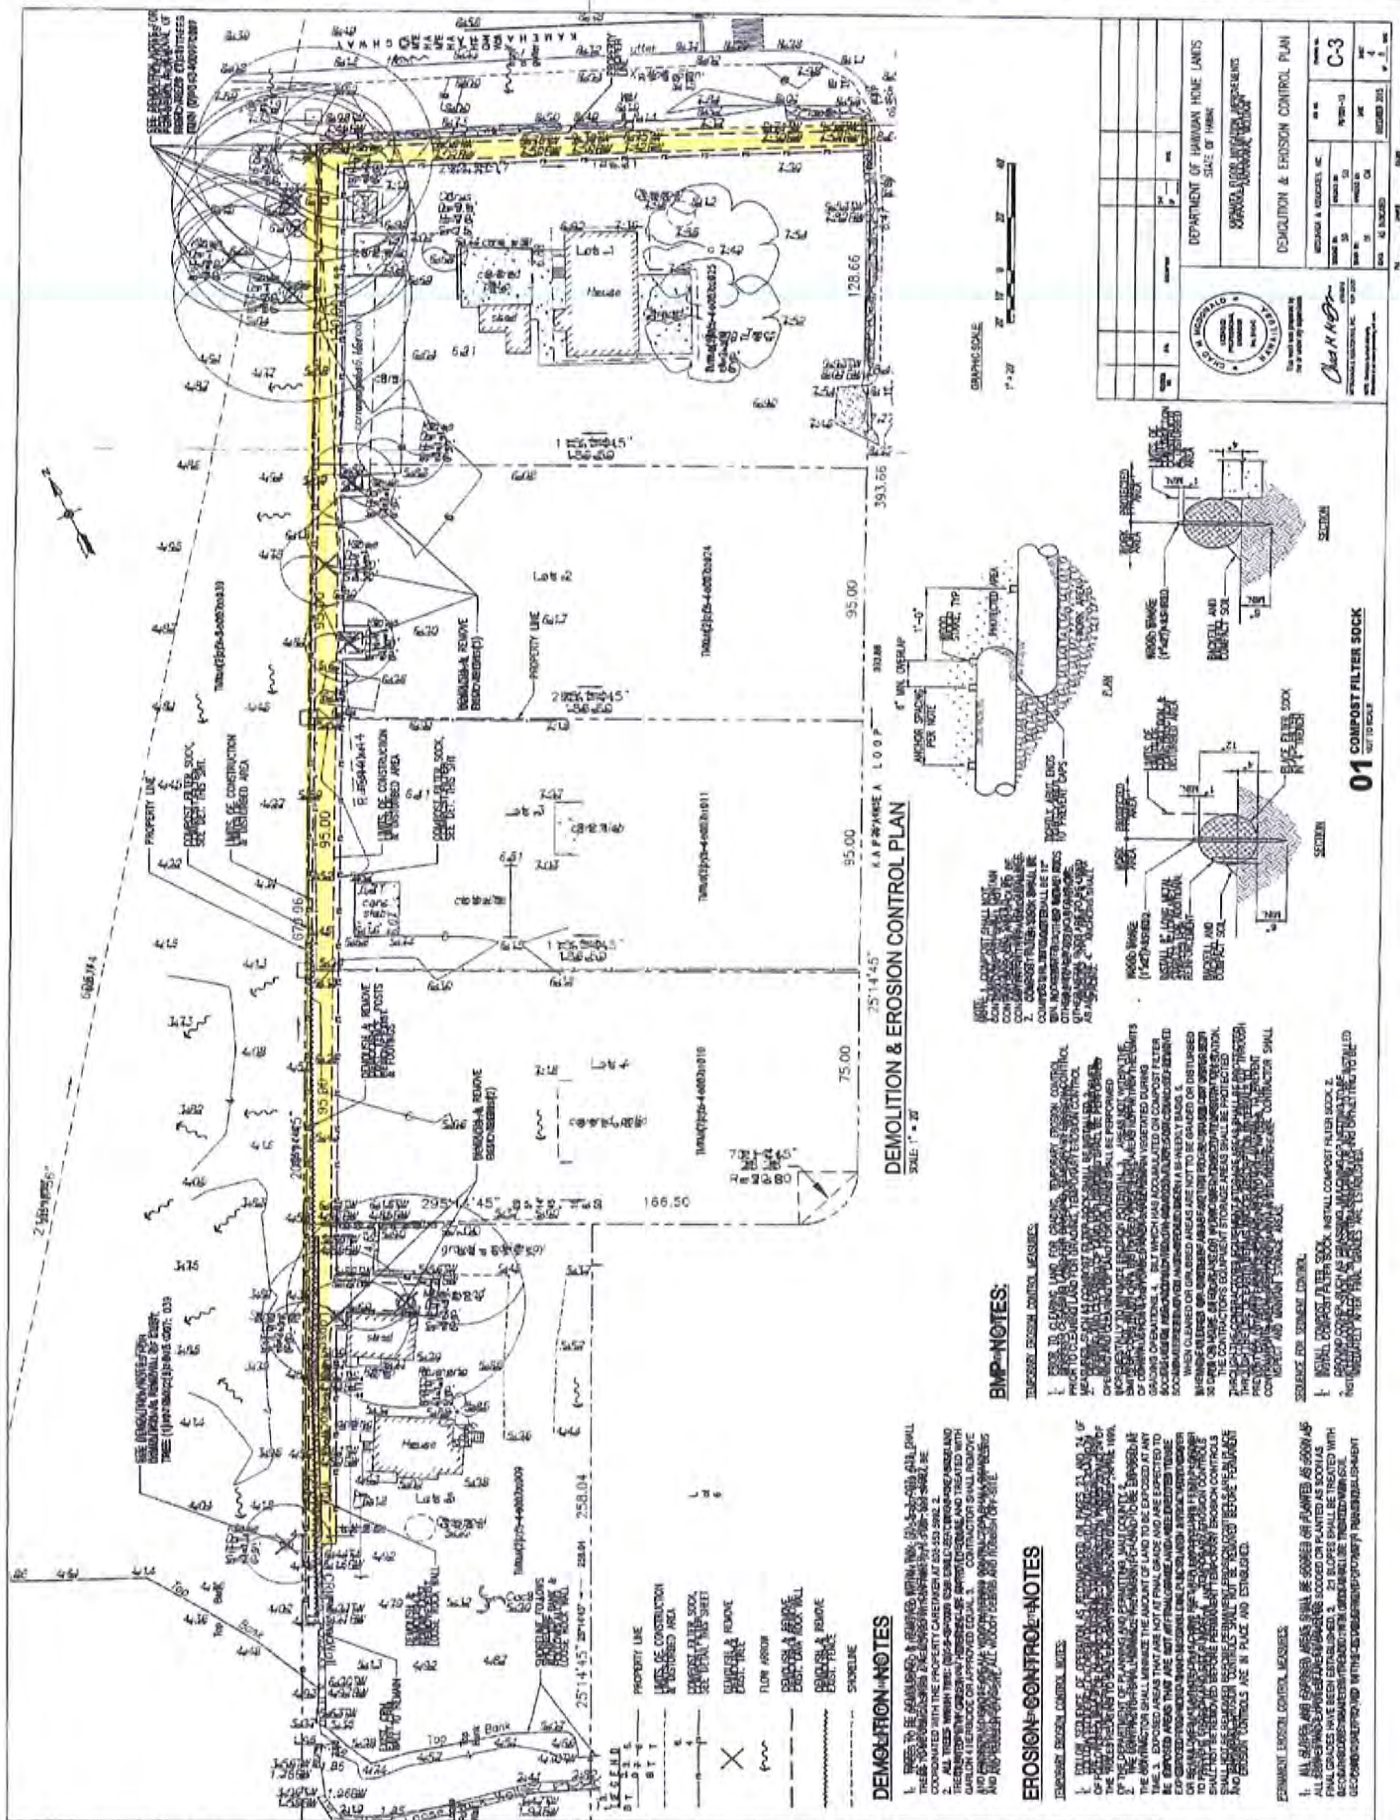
DHHL Kapa'akea Flood Mitigation Project site plan
